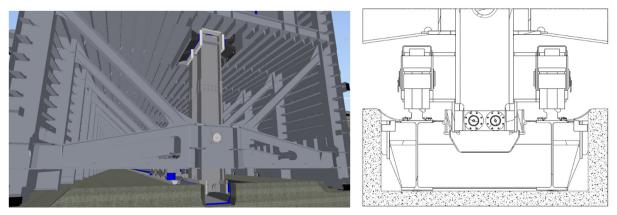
Cross section of horizontal guidance structure and rail beam structure
